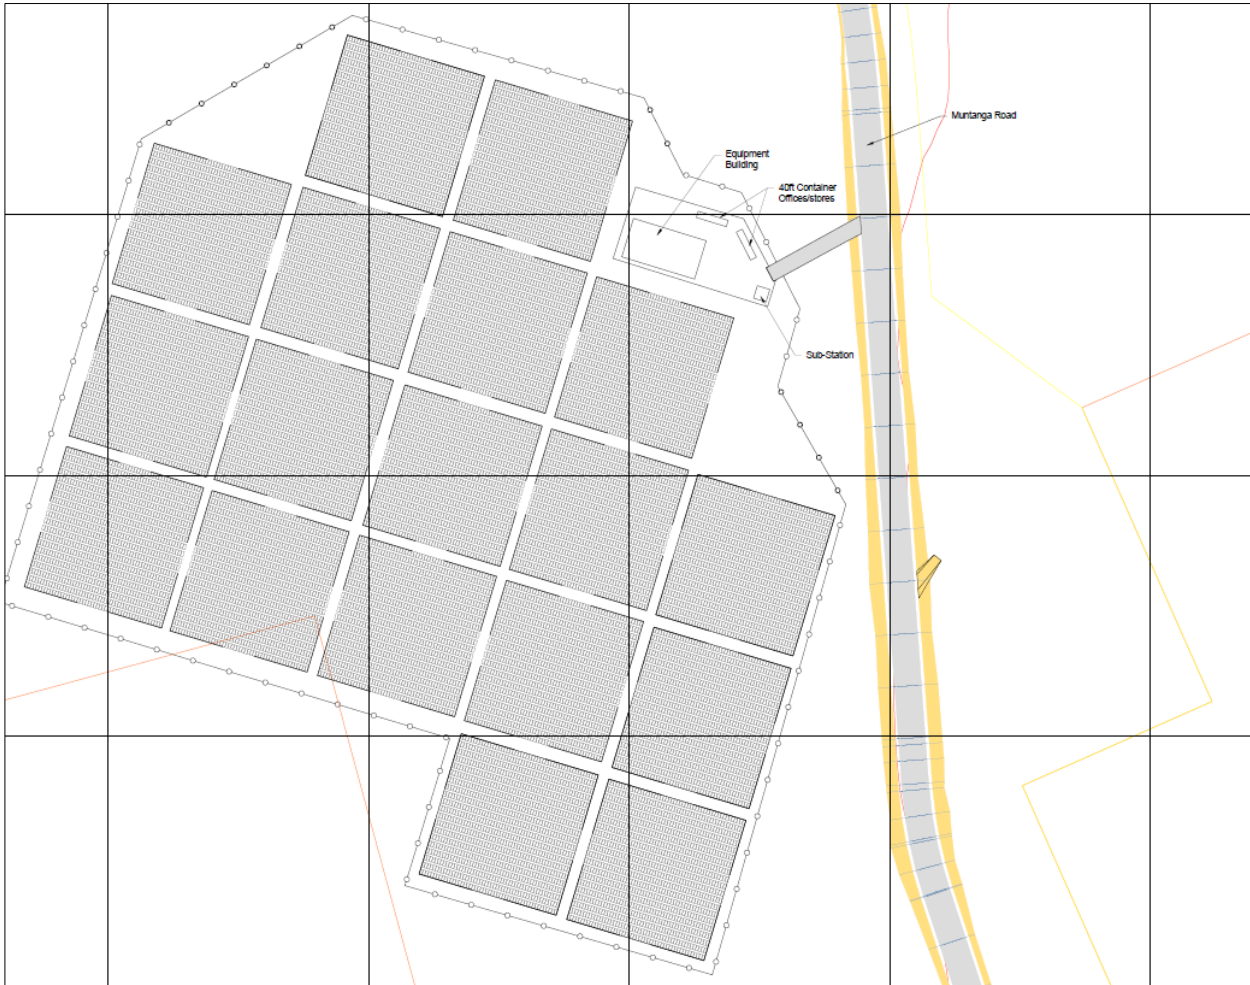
Proposed Muntanga 9MW solar plant layout and location
